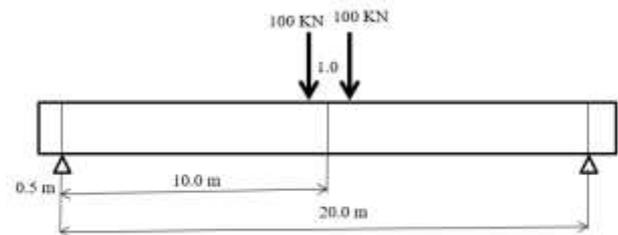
Geometry and loading conditions for the proposed steel trapezoidal-box girder.
